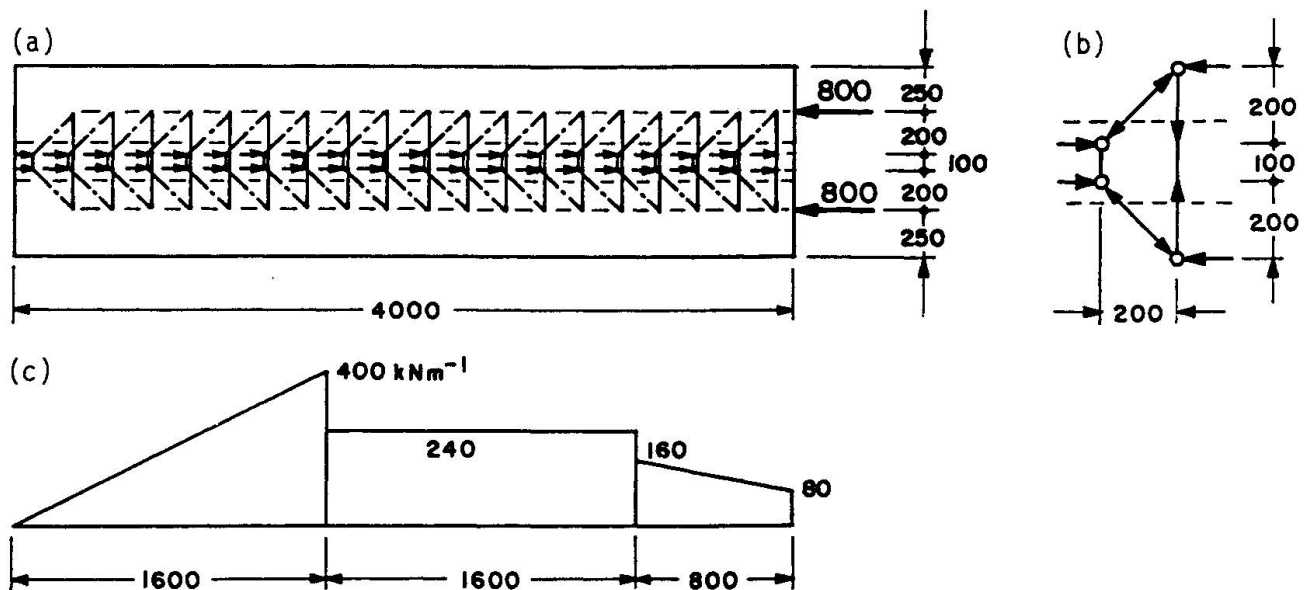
Truss model for top flange: (a) Overview; (b) Detail; (c) Shear flow between web and either side of flange.
